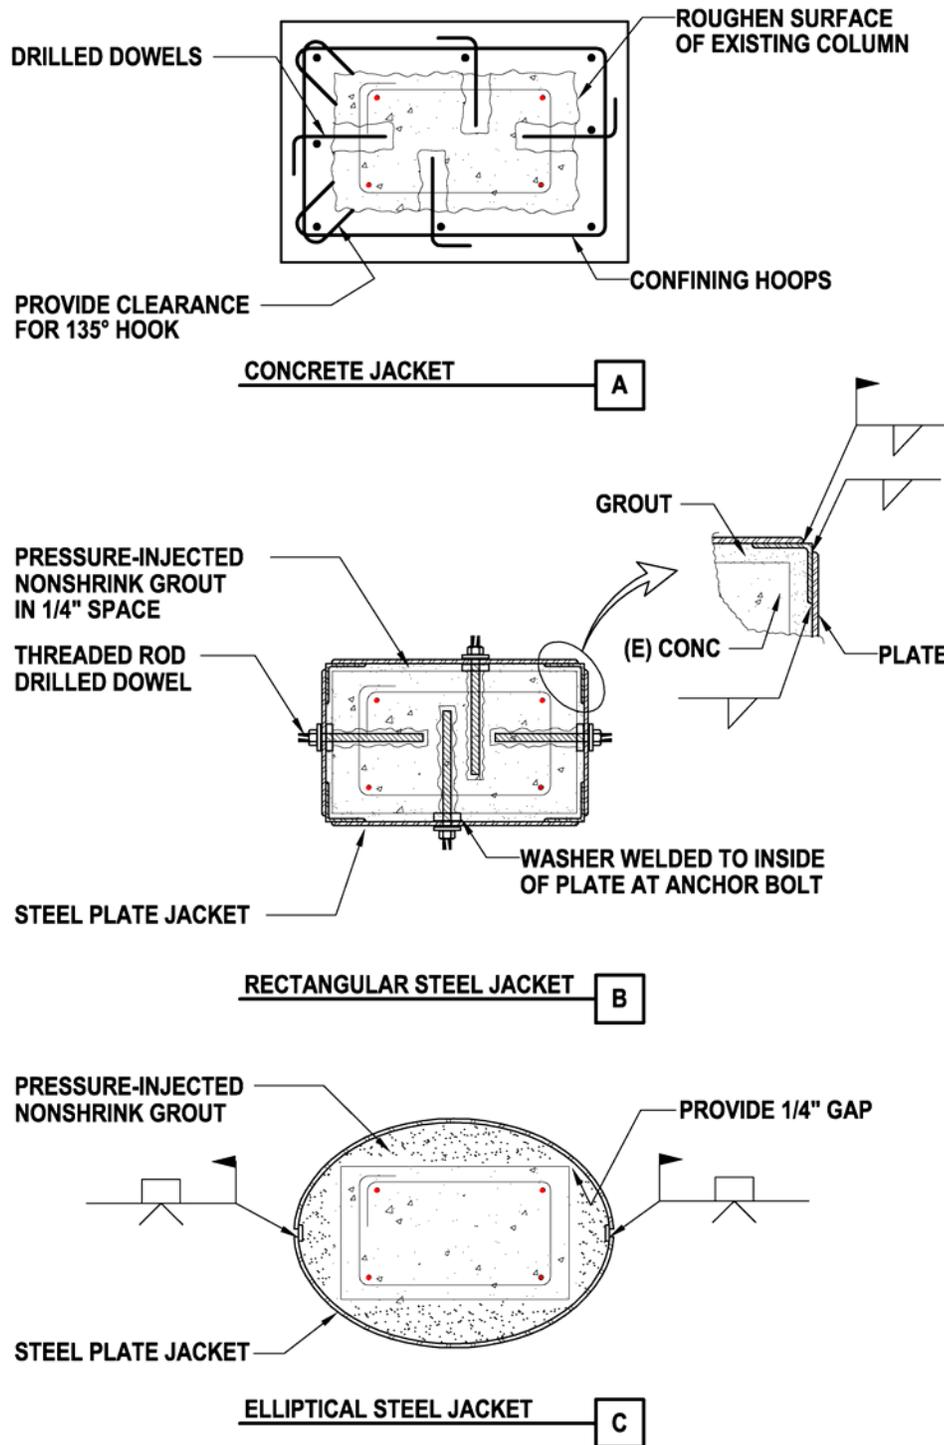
Concrete and Steel Overlays for Concrete Columns
